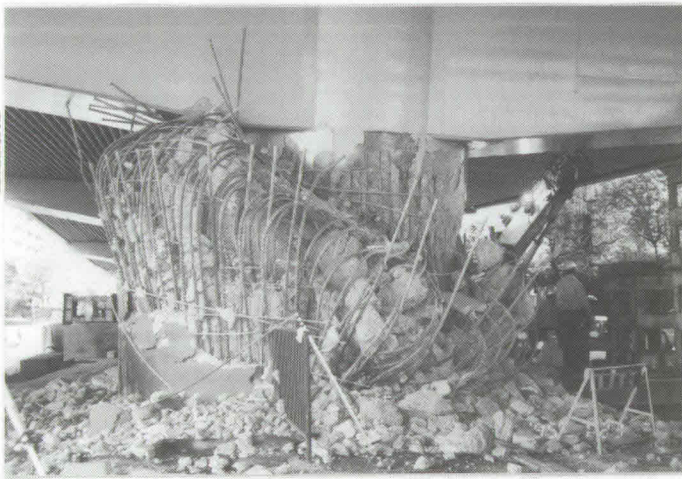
Collapsed RC pier of elevated expressway (Kobe Route, near Tateishi intersection in Nishinomiya)
